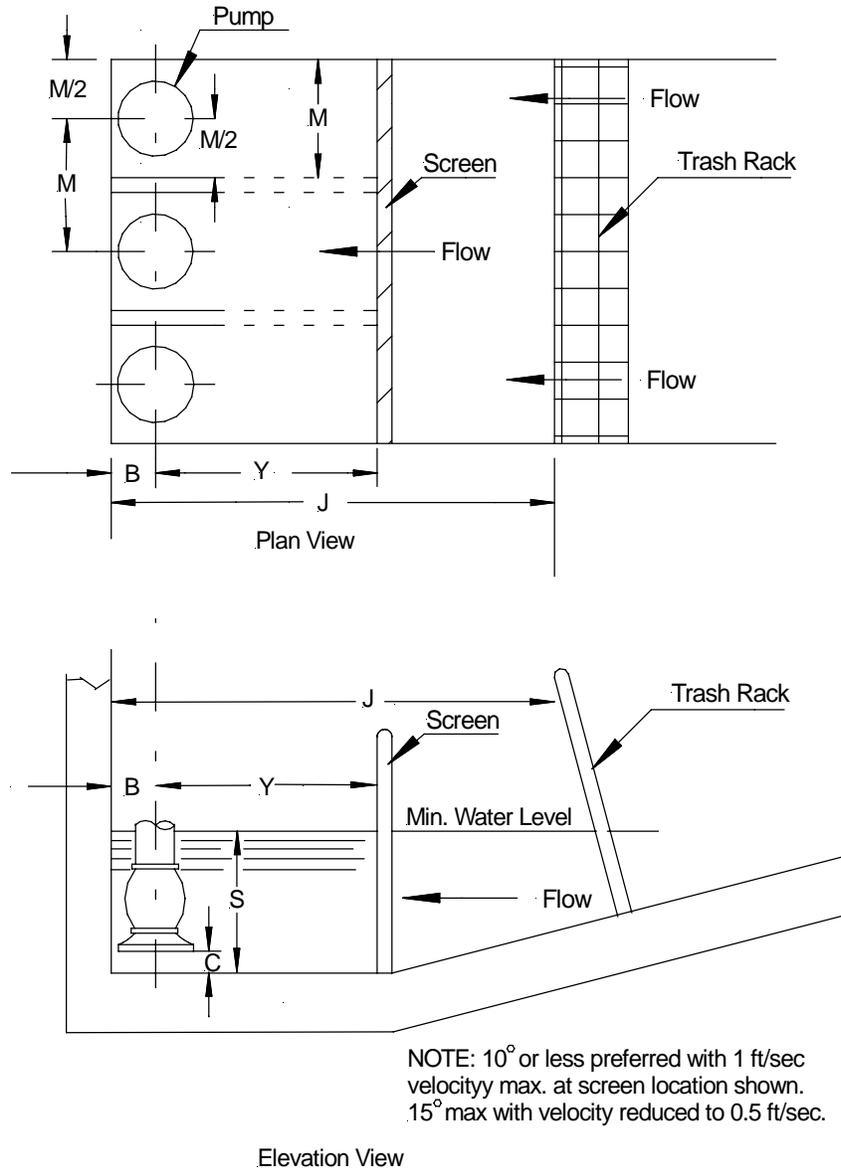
Sump Dimension, Wet Pit Type Pumps
